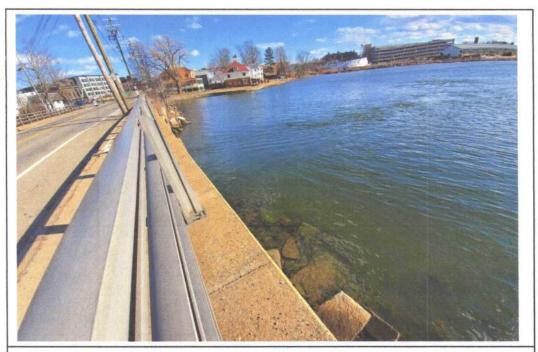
North Mill Pond, Landward Side, View Southeast from West Side of Culvert in Maplewood Road, Mid-Incoming Tide (2/28/2020)
